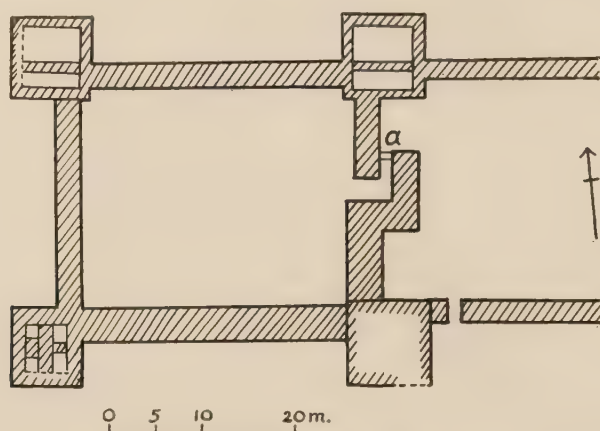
THEANGELA: PLAN OF TETRAPYRGON
